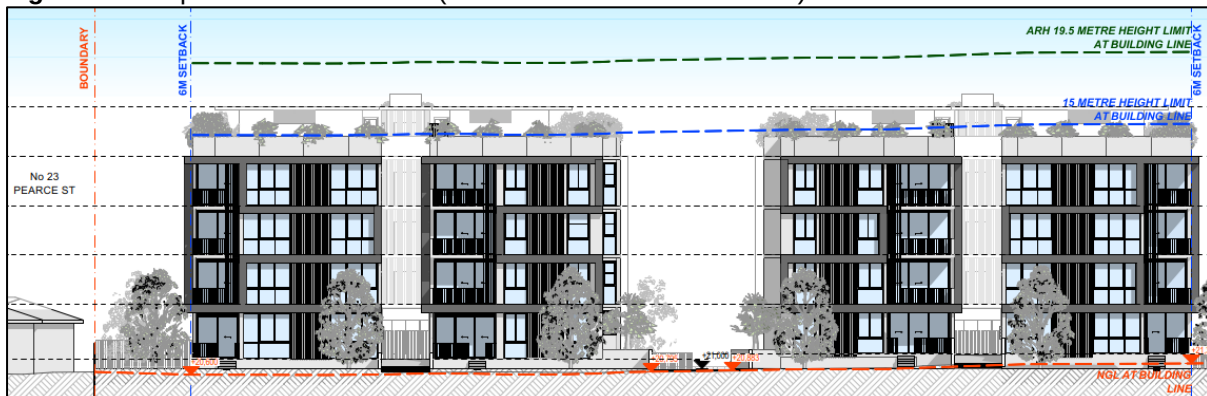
Proposed South Elevation (Source: Mackenzie Architects)
